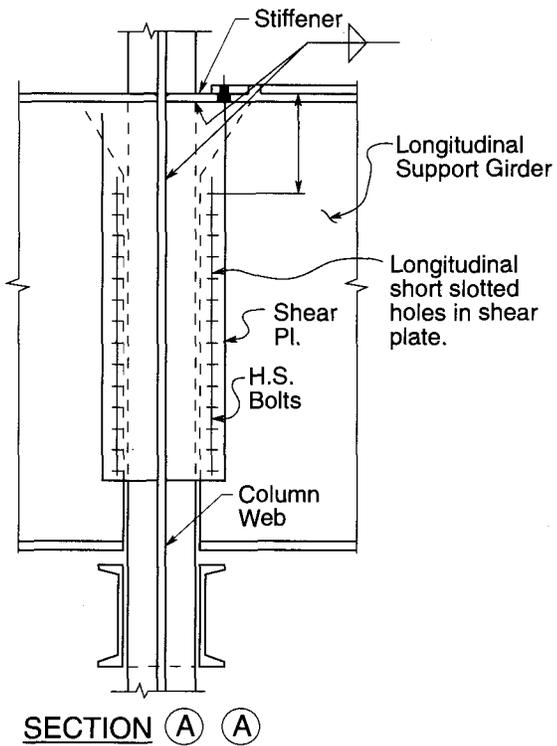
Sections A and C of Fig. 18.2.4
